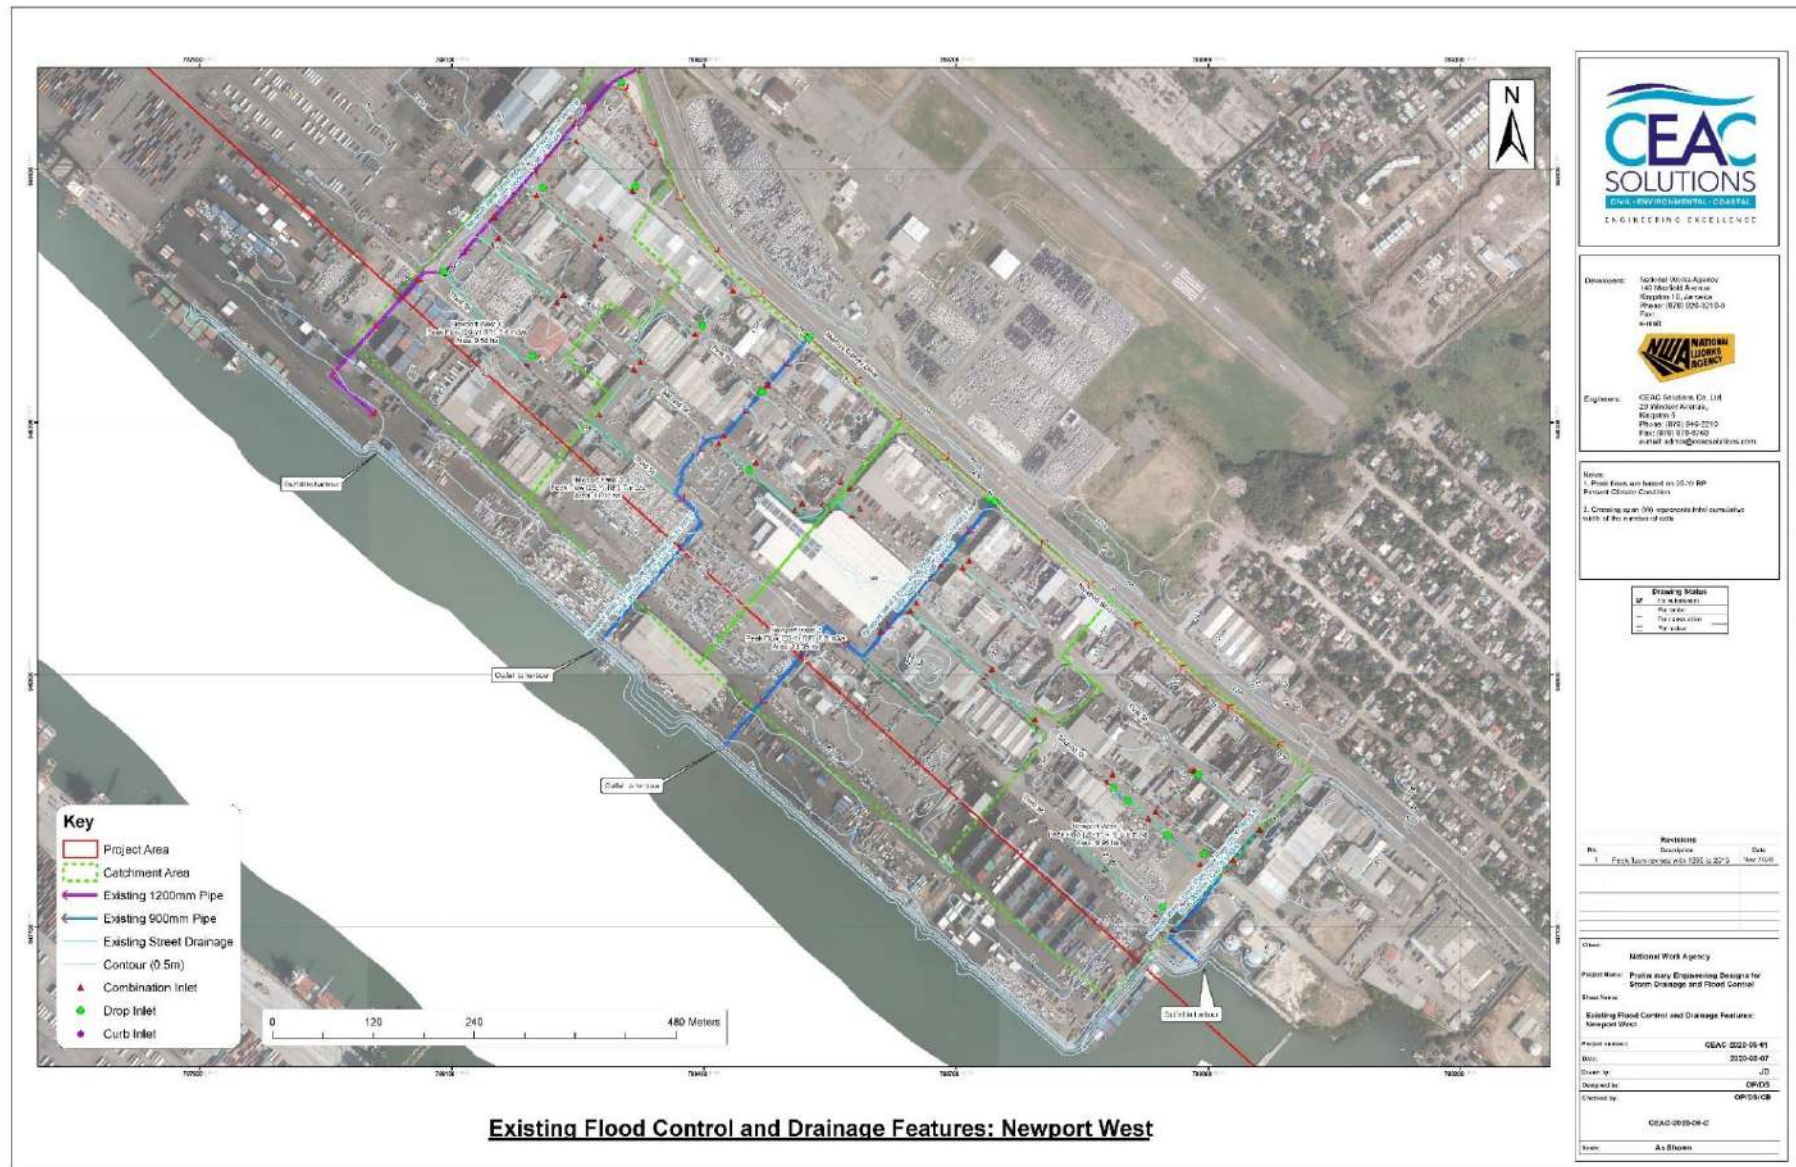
Existing Flood Control and Drainage Plan for Newport west.
